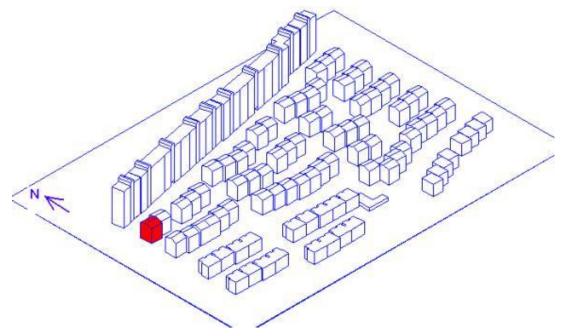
Poor ventilation with this type of flanking building geometry (Chen, 2007).
